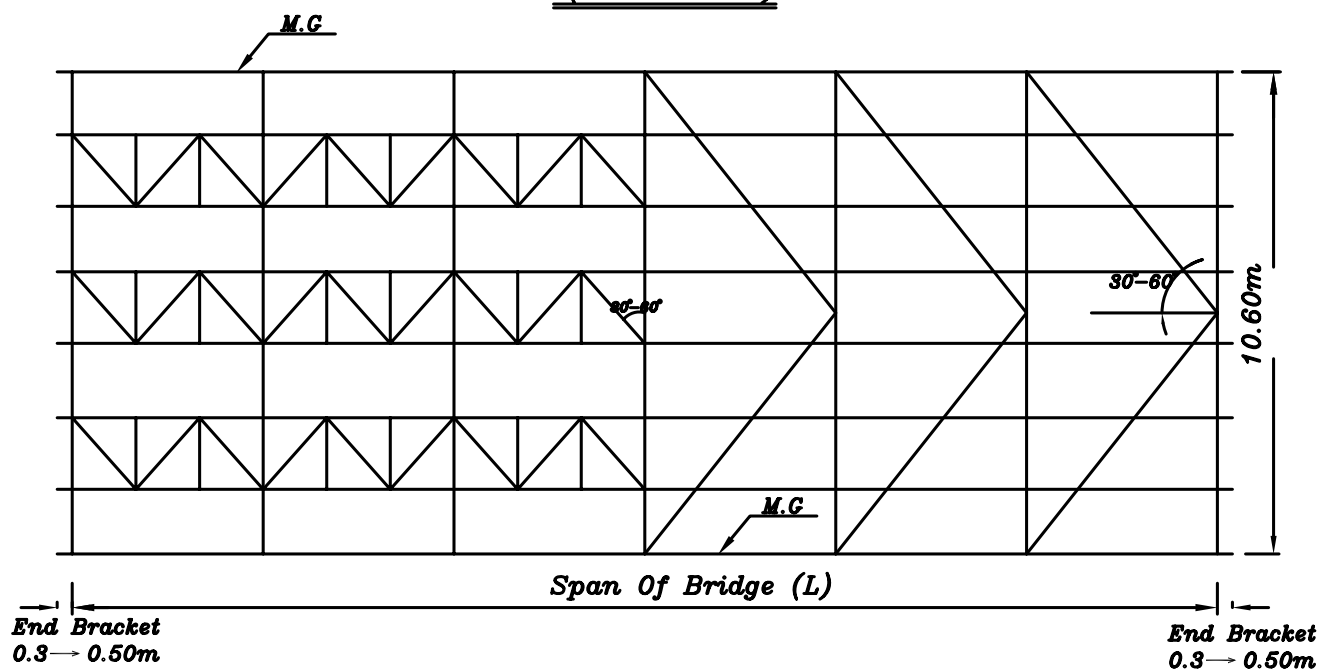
# PLATE GIRDER DECK BRIDGE RAIL WAY WITH INVERTED U-FRAME. (TRIPLE TRACK)
